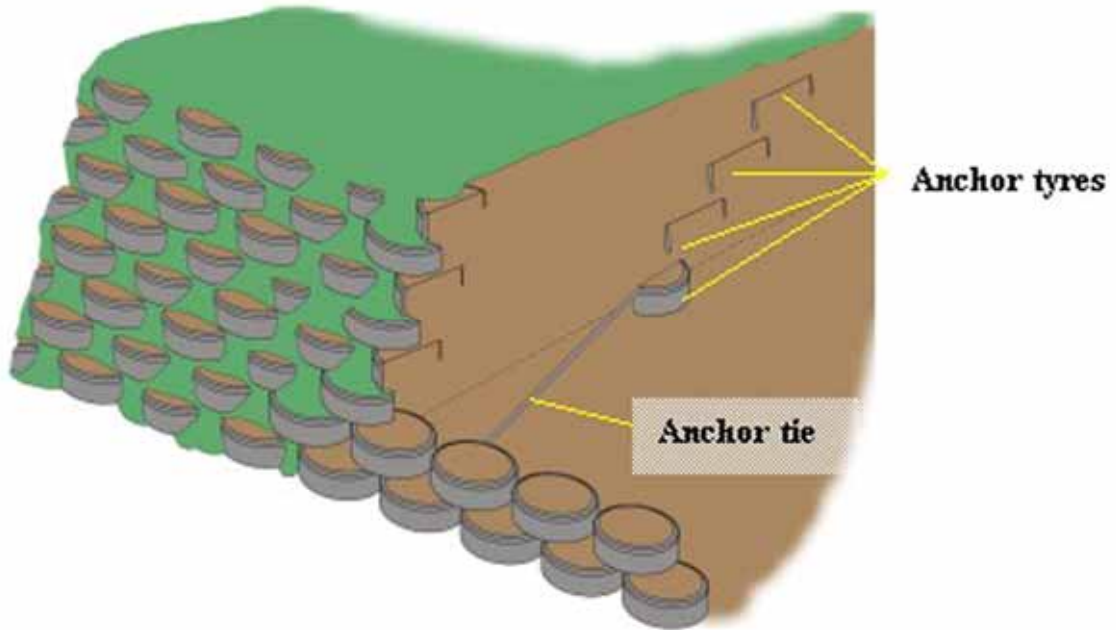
Gravity retaining wall structure showing anchor ties and tyres
